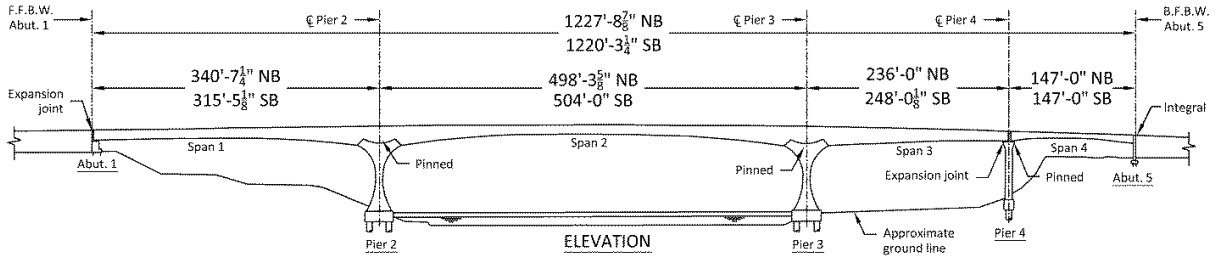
Elevation view of the I-35W Saint Anthony Falls Bridge (French et al. 2012)
